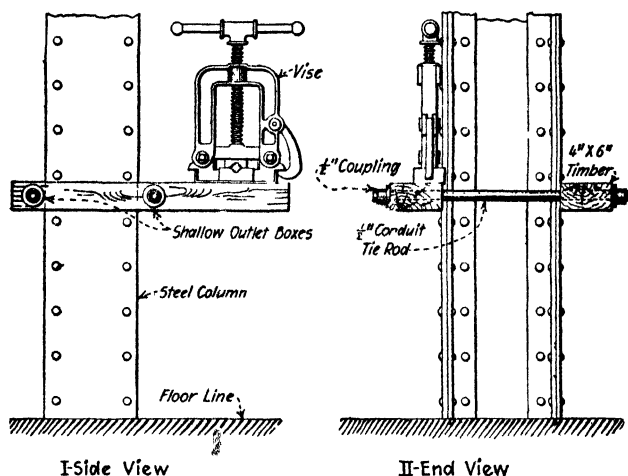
Mounting a vise on a steel column, using conduit materials and two 4 by 6 in. timbers.
